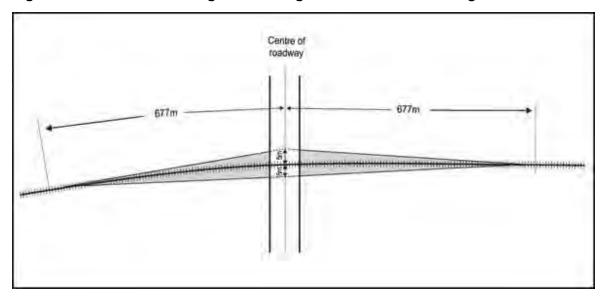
Restart sight site triangles for rail level crossings
